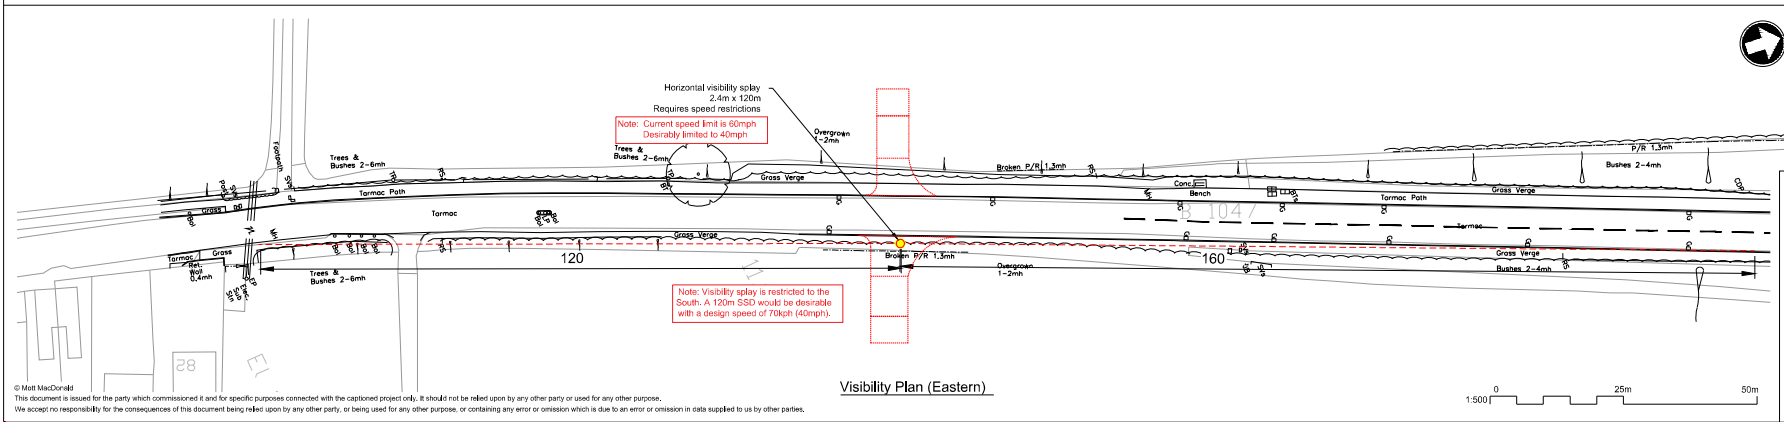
MMD-01-XX-DR-C-DRAFT
